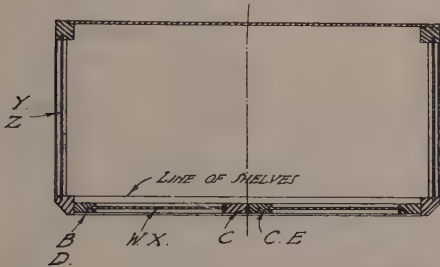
SECTIONAL PLAN OF CUPBOARD.
